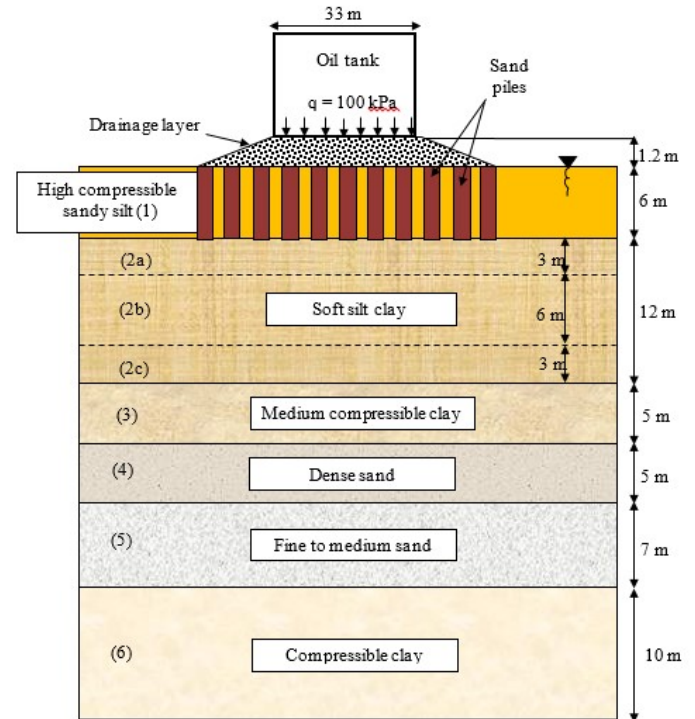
Adopted soil profile of oil tank foundation (Bouassida et al, 2019)
